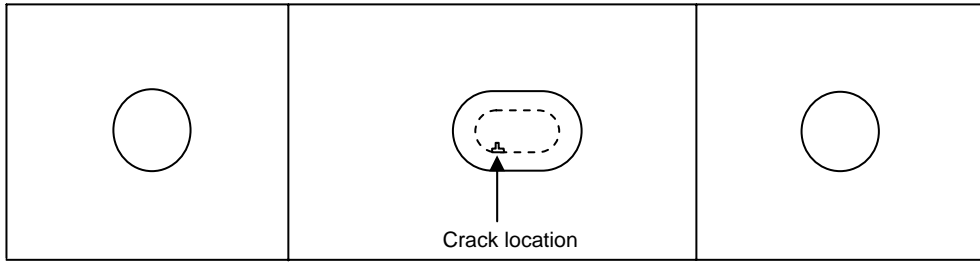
Mousehole specimen, gauss measurement guide inserted in mousehole.
